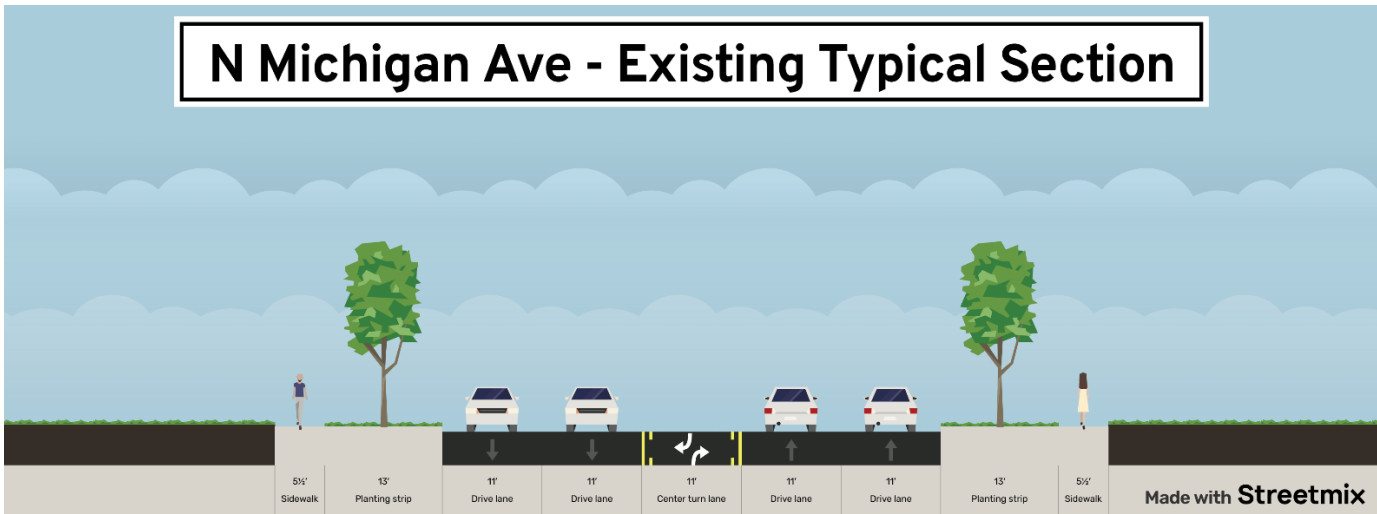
Existing Cross Section 1 - Michigan Ave from Williams St to Adams St and Hancock St to Genesee Ave
